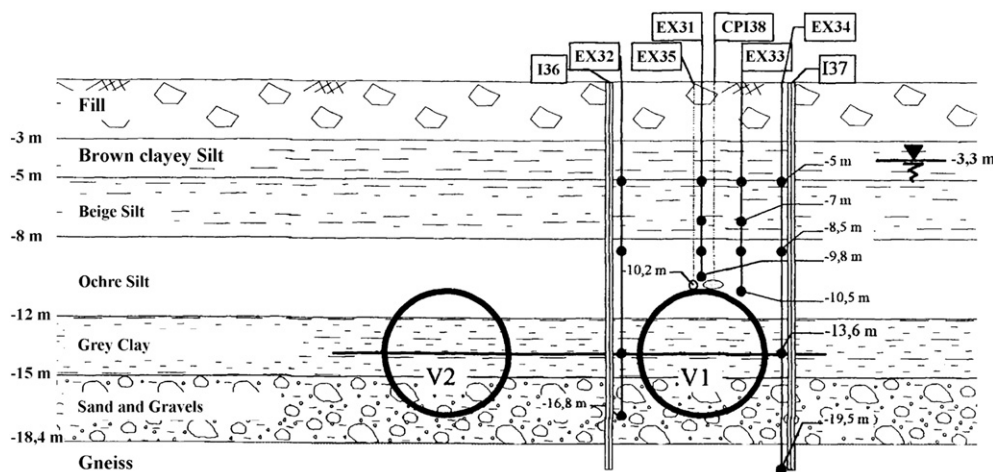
Instrumentation of the Lyon-Vaise tunnel alignment – Section S2.
